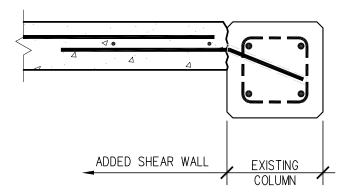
E: NEW SHEAR WALL AT EXIST. COL.
